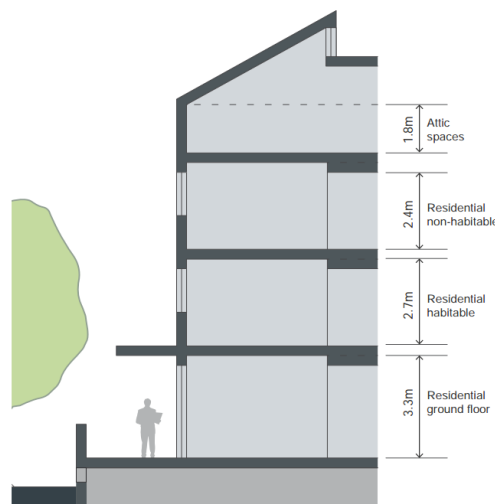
C.2 Ceiling heights of minimum 2.7m help to achieve good daylight access and natural ventilation to residential apartments
